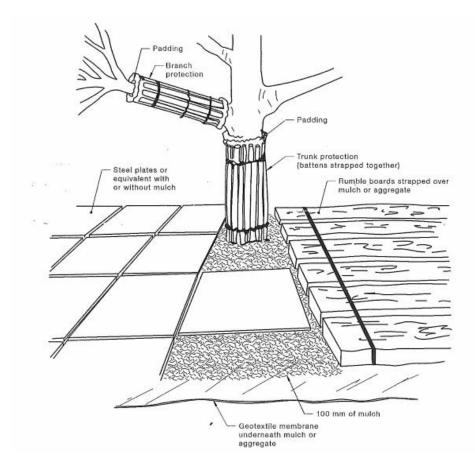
Trunk and branch protection shall be installed as shown in the attached diagram. The materials and positioning of protection are to be specified by the project arborist. A minimum height of 2m is recommended. No temporary power lines, stays, guys and the like are to be attached to any part of the tree. Do not drive nails into the trunks or branches. If temporary access for machinery is required within the TPZ ground protection measures will be required. Measures may include a permeable membrane such as geotextile fabric beneath a layer of mulch or crushed rock below rumble boards.
